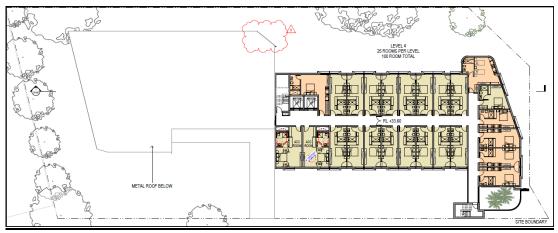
Proposed hotel level 4 plan (indicative levels 2 & 3)
